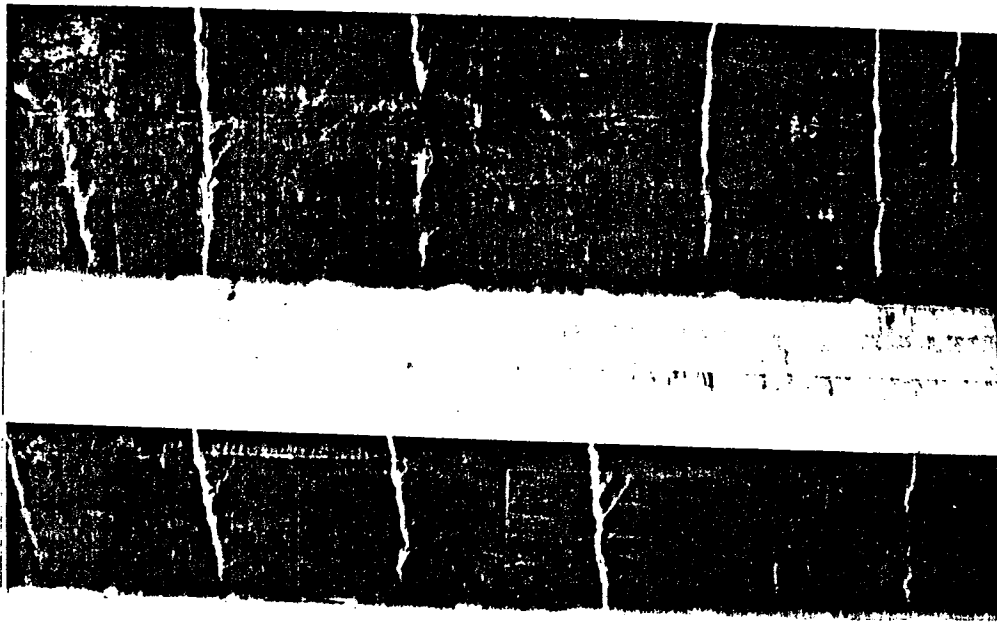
Transverse cracks in deck stopping short of girder.
